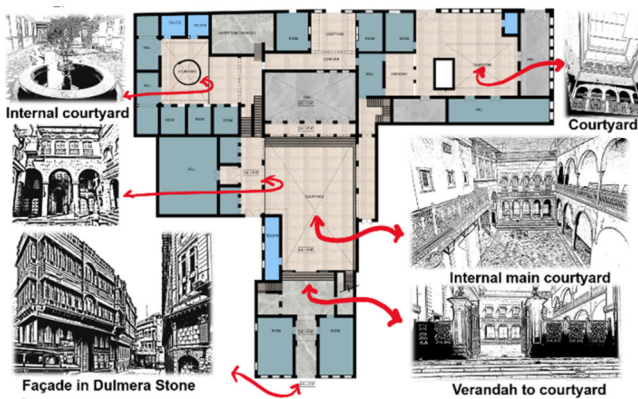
Plan of a Haveli in Bikaner , Rajasthan with application of dulmera stone on facade.
